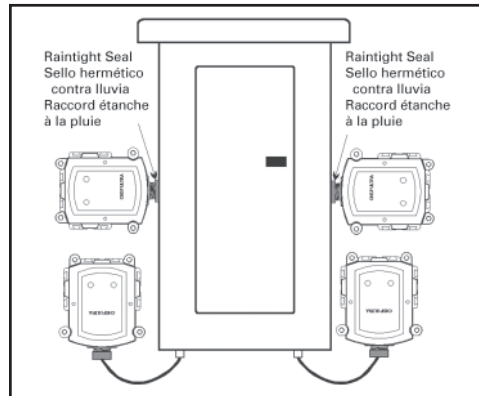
Outdoor Installation (2)/Instalación exterior (2)/Installation à l'extérieur (2)
